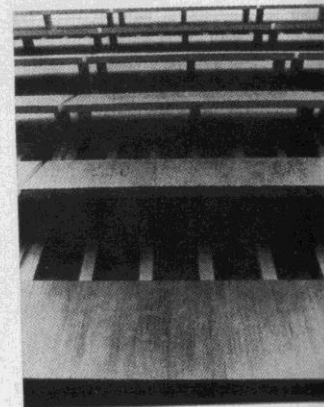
American Library building in New Delhi shows details of sunshade projecting away from window to avoid transfer of heat into the interiors of building.
